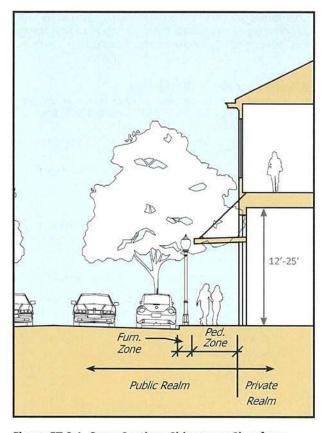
Cross Section, Chinatown Shopfront Frontage (Illustrative)
